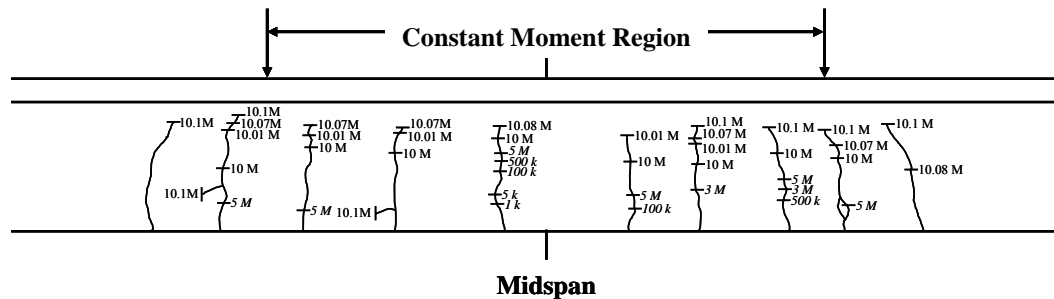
Crack Pattern for Beam 6A after Final Static Test at a Strand Stress Range of 45 ksi
